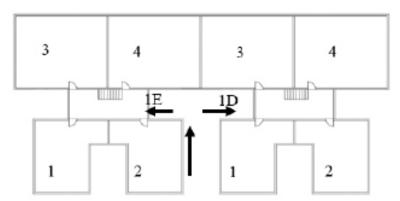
Typical Plan of Apron Flats. Sharing access within one building. One staircase and one corridor serve fewer units (Source: Author's Documentation)
